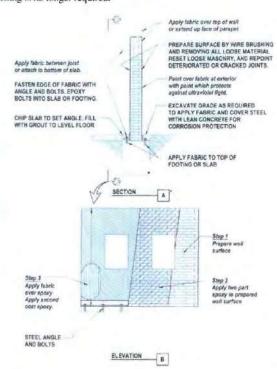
FEMA Typical Detail for FRC Strengthening to a URM Wall¹⁵.
